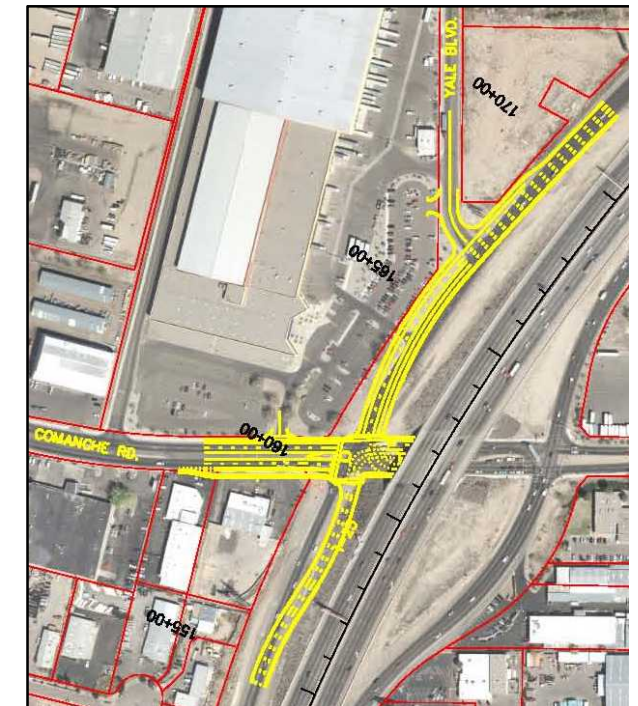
, Eliminated Southbound Frontage Road Realignment Alternative
